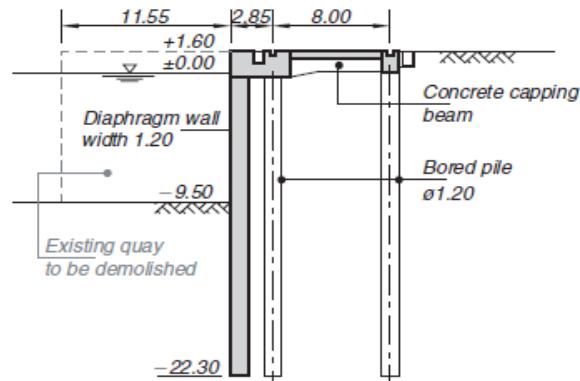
a): Renovation with a diaphragm wall to the rear of the existing quay, Naples (Broeken and De Gijt, 2014)
